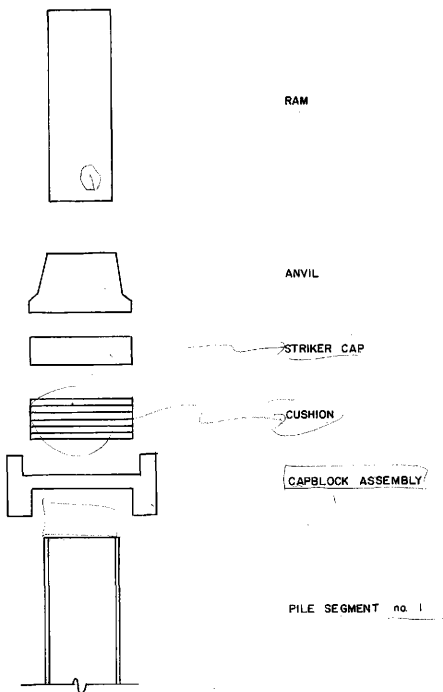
ICE 640 Diesel Pile Driving Hammer. Schematic Drawing
